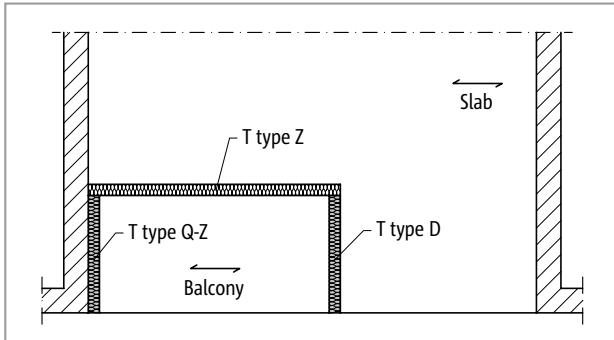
Schöck Isokorb® T type D, QZ; Z: One-way spanning
